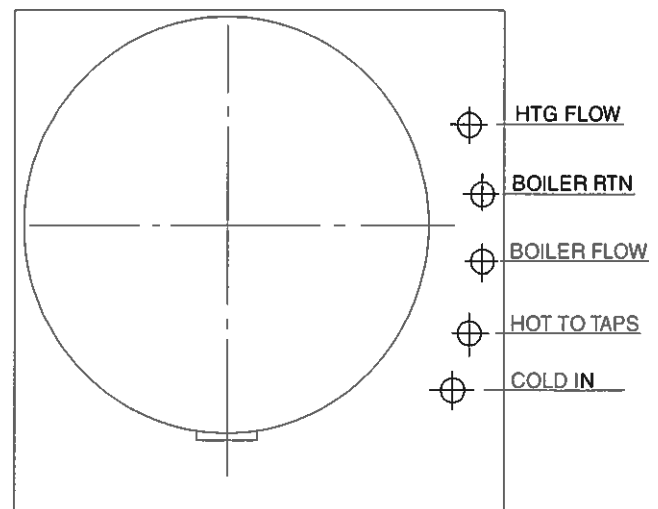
Typical arrangement of pipework in cylinder cupboard.
